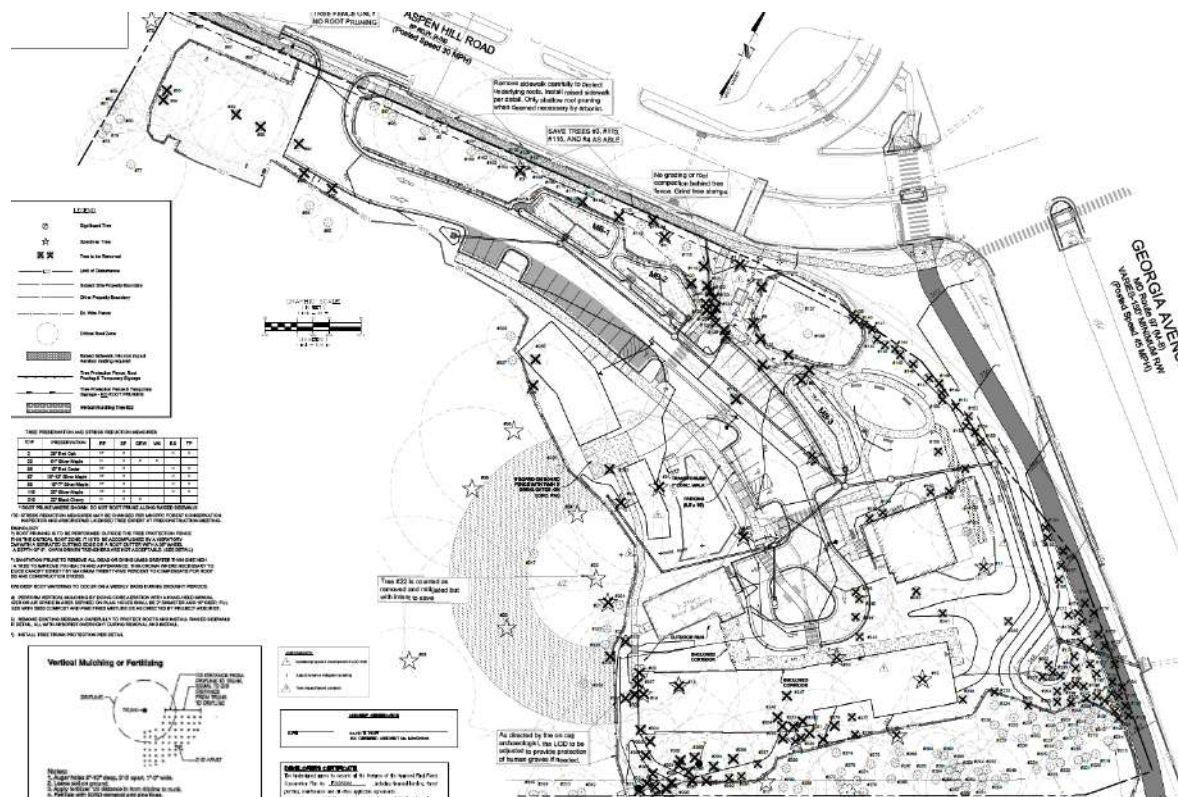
Site plan showing the proposed tree removal (Forest Conservation Plan, L8.04).
